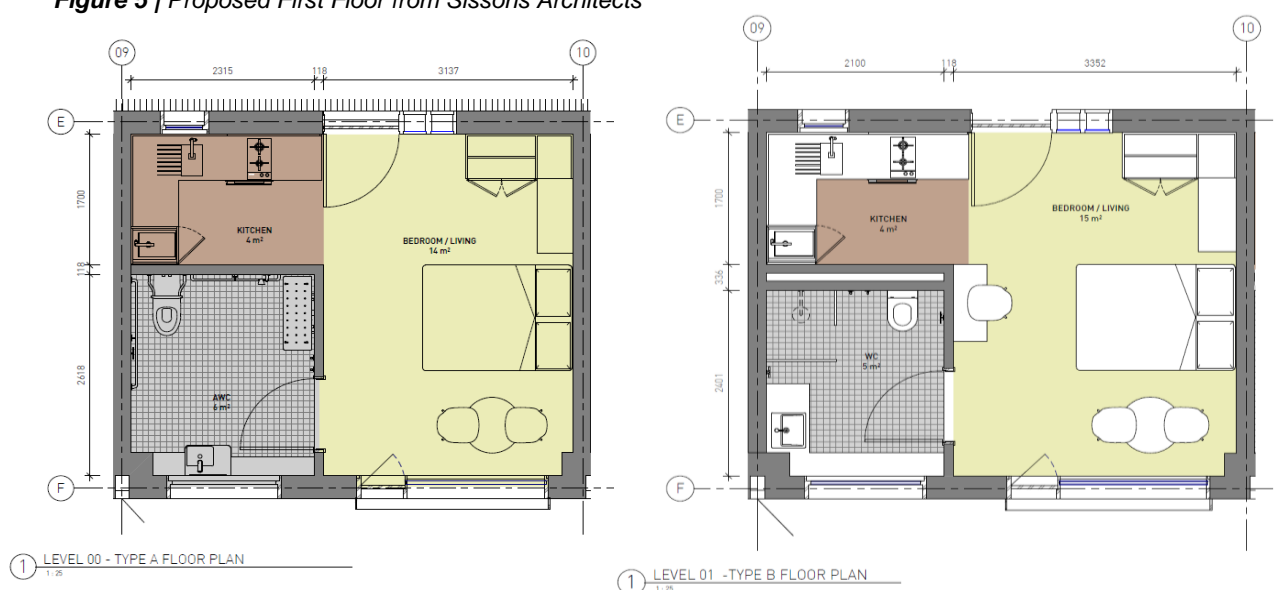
| The two types of boarding rooms proposed within the development - Type A and Type B from Sissons Architects
